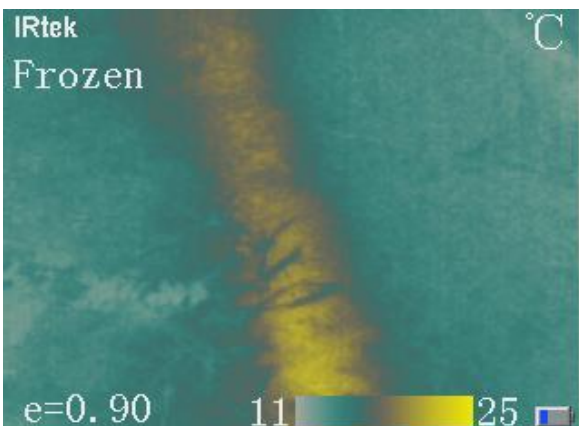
Buried hot water piping – Thermal image showing heat loss into soil
